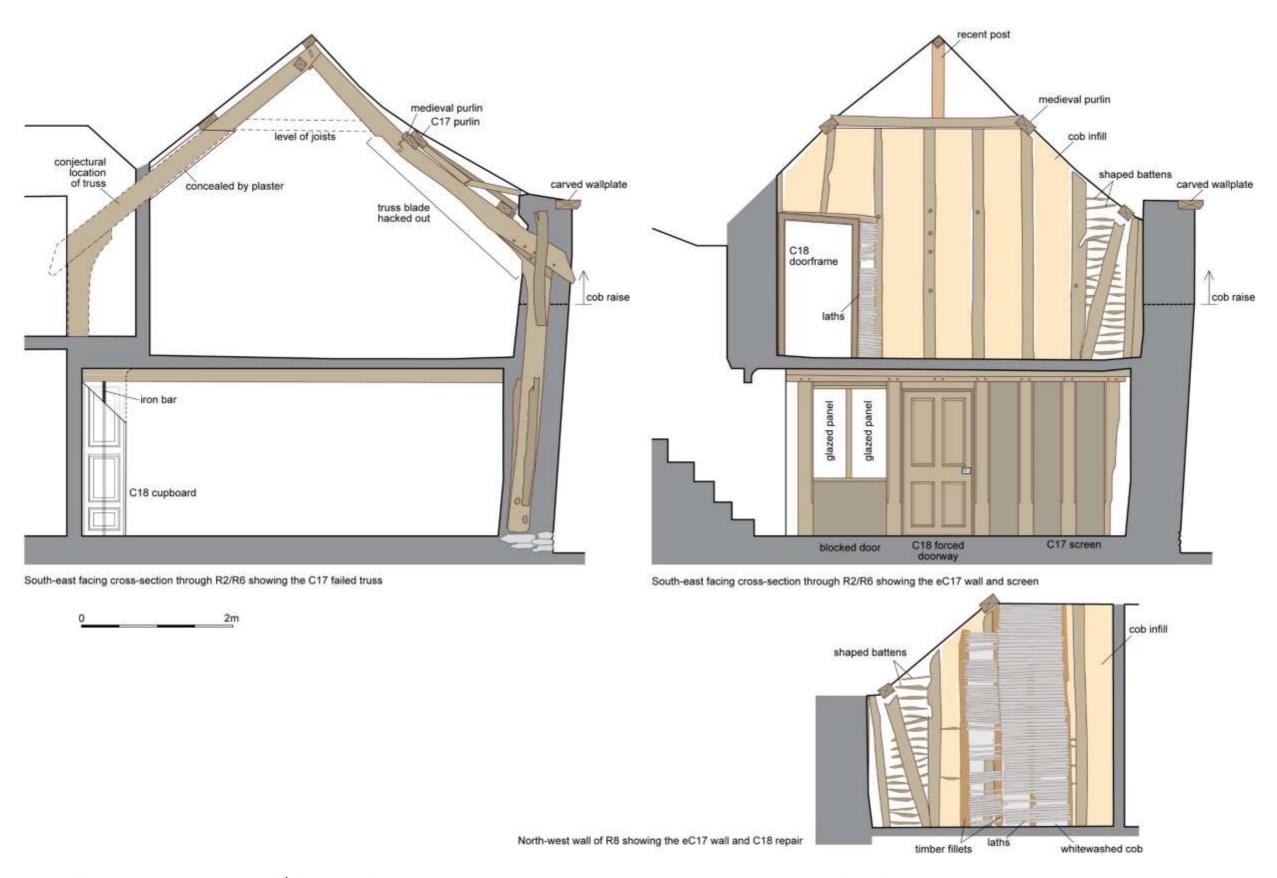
SOUTH-EAST FACING PROFILES THROUGH R2/R6 SHOWING THE C17 TRUSS, WALL AND SCREEN, WITH THE NORTH-WEST FACING PROFILE OF THE PARTY WALL BETWEEN R6 AND R8.
